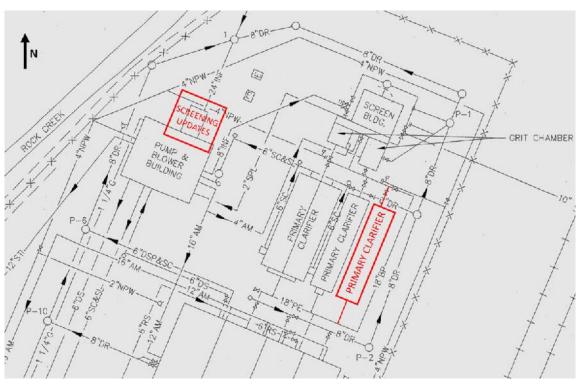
Proposed Changes to Screening and Primary Clarification on Existing Site Piping
